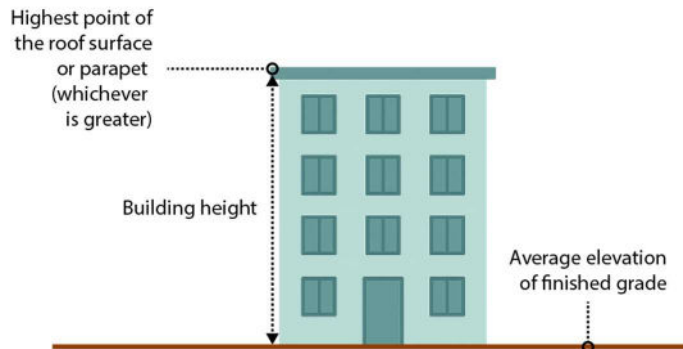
Diagram of Height Measurement for a Building with a Flat Roof
